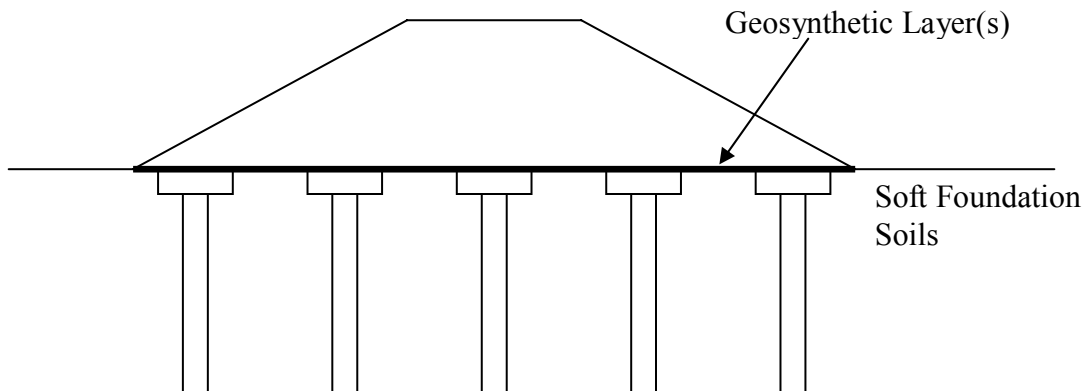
Pile-supported embankment with geosynthetic reinforcement (after Jones et al. 1990)
